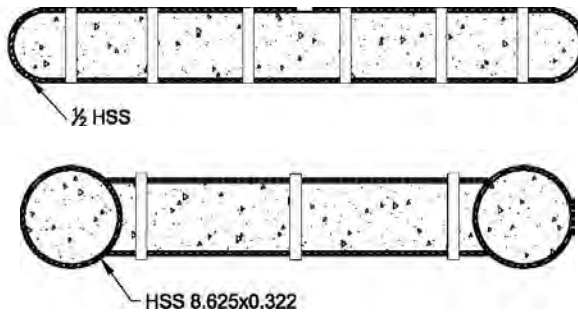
Configurations of Concrete Encased Composite Plate Walls
